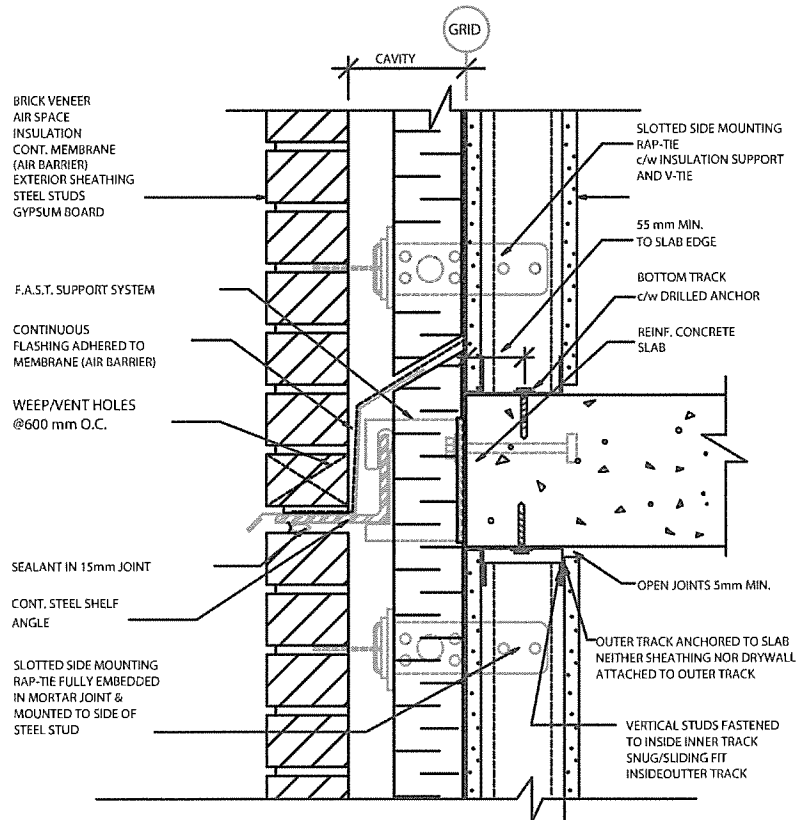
BRICK VENEER/STEEL STUD - DETAIL AT SLAB EDGE
